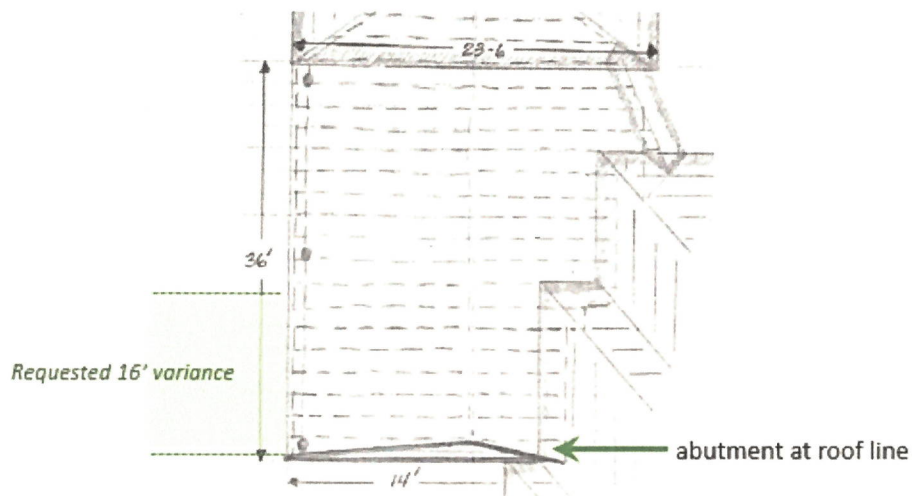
Figure B. Rendering of aerial view of proposed wood-framed carport is to replace the existing metal carport which extends 36' from the detached garage.
